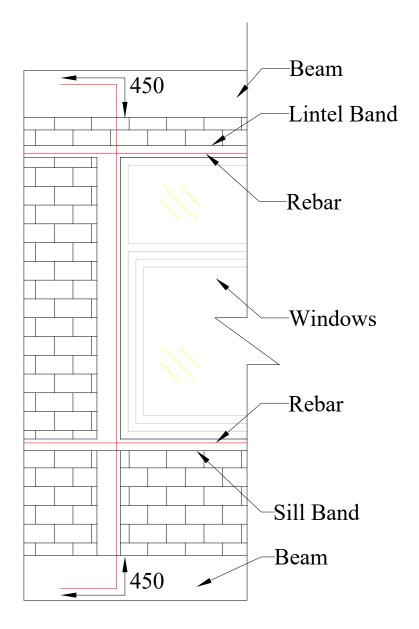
BAND DETAILS FOR SOLID WALL WITH OPENING
